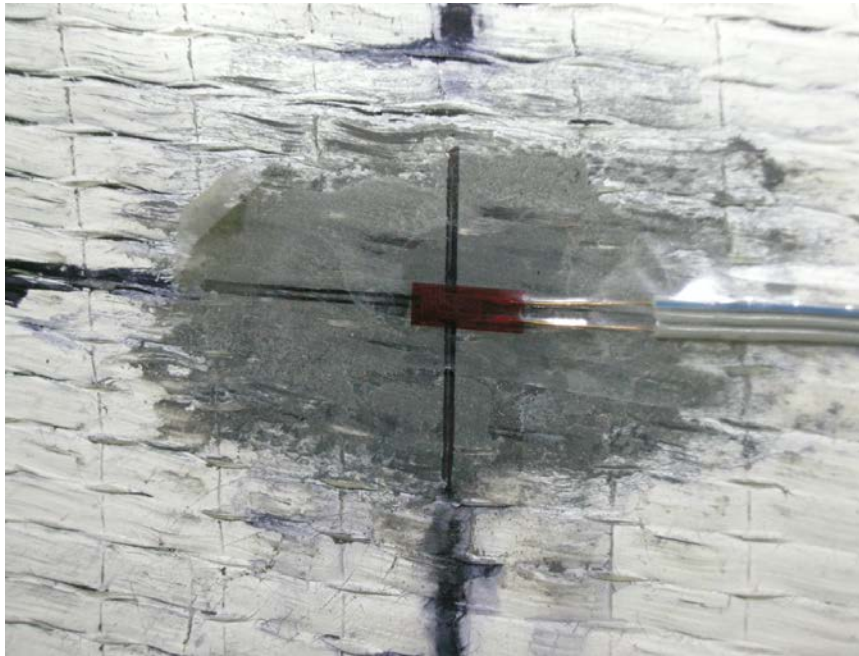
Surface-mounted strain gage—FRP reinforcement
